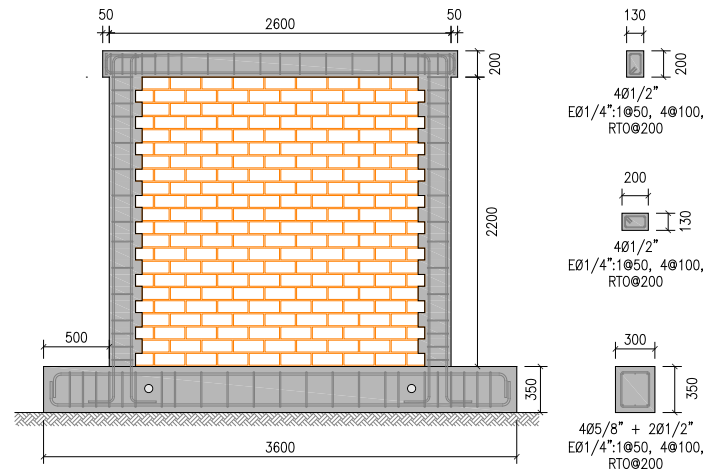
Geometry and reinforcement detail of a typical wall (dimensions in millimeters)
